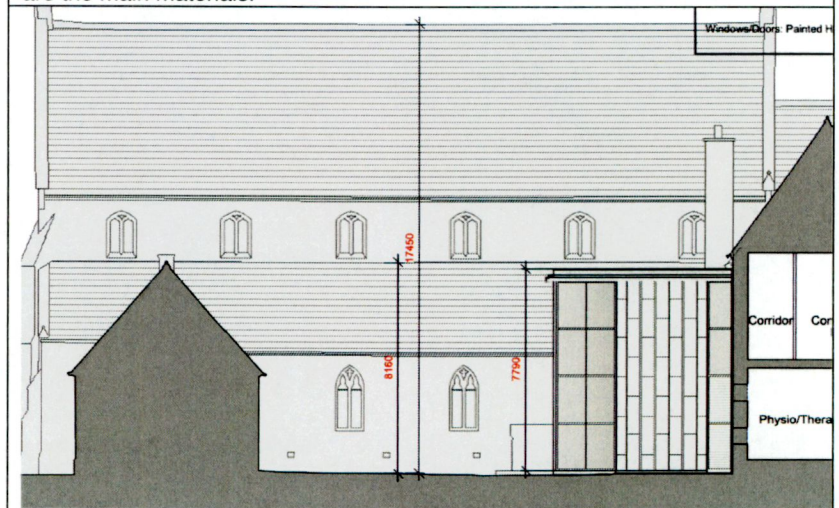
Side elevation of proposed new staircase 1 – note the junction with the existing walls to be formed of a glazed band.
